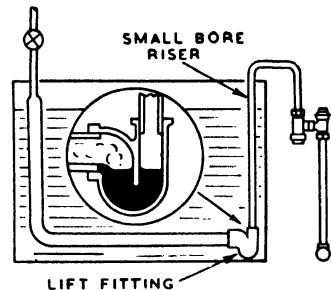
WATER SEAL APPLIED TO TANK HEATING ELEMENT TO PREVENT STEAM LOCKING
